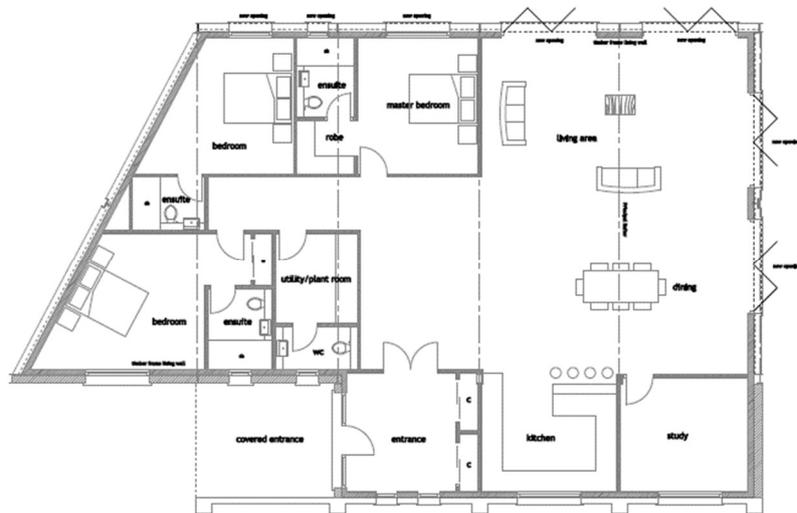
Proposed Ground Floor Plan – previously approved scheme
